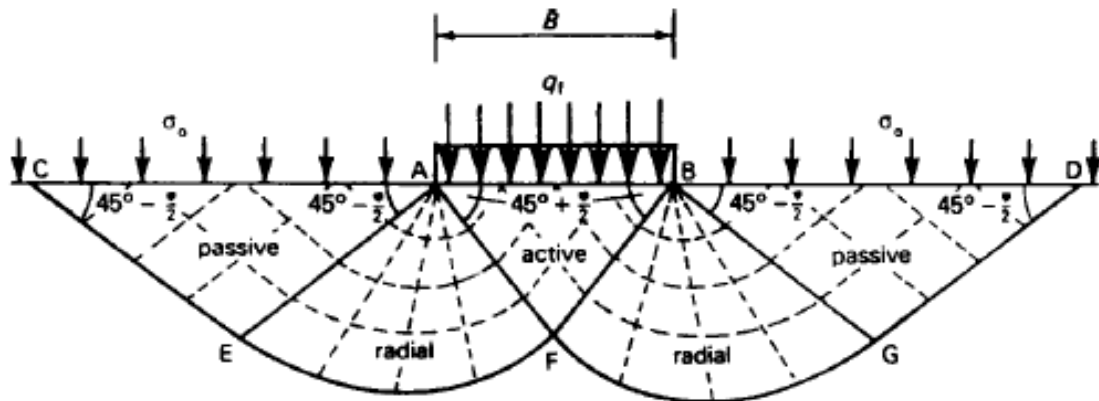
Failure surface in soil at ultimate load for a continuous rough rigid foundation (source: Terzaghi, 1948)
